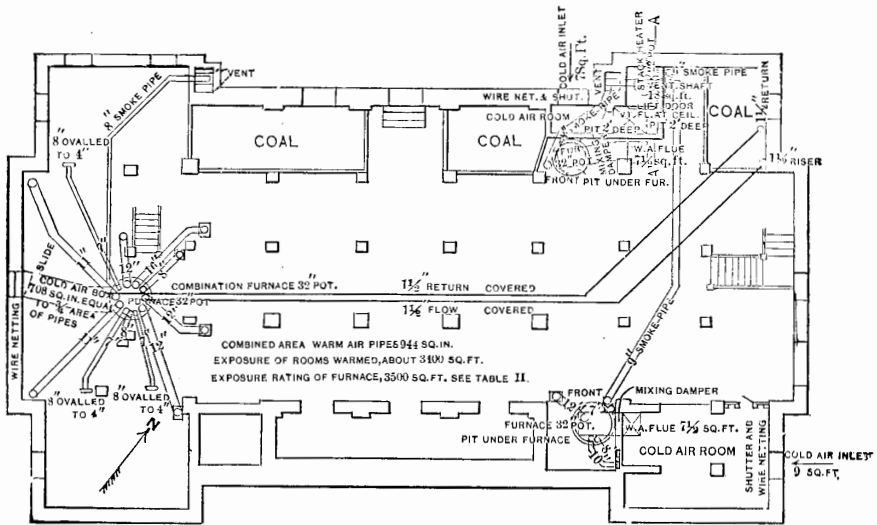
Furnace System of Heating and Ventilating a Town Hall.—Basement Plan.
